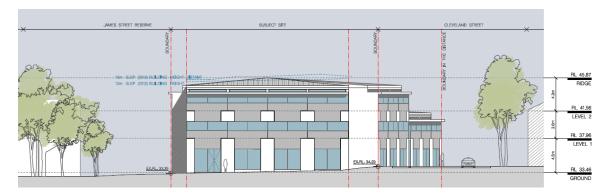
Pre-DA Scheme 1 - Marriott Street Elevation
